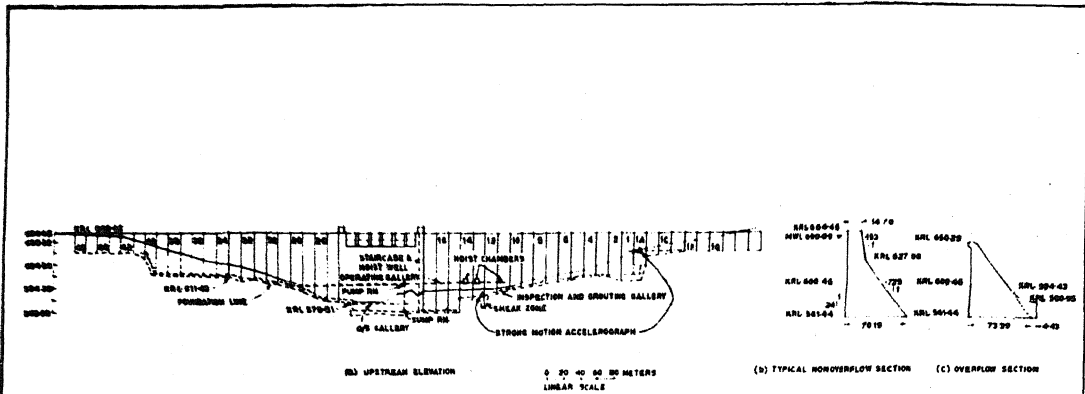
KOYNA DAM-ELEVATION AND SECTIONS.
